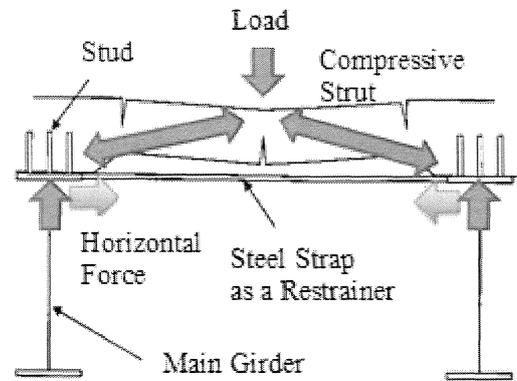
Compressive Membrane Action in Concrete Slabs of Composite Girder Bridge
